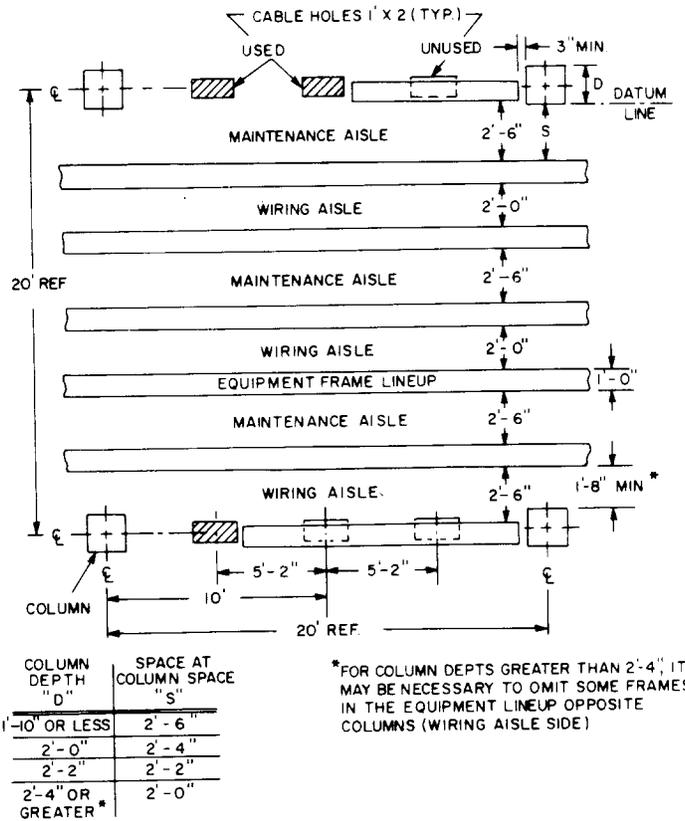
Typical Standard Floor Plan for Principal Depth 12-Inch Frame
